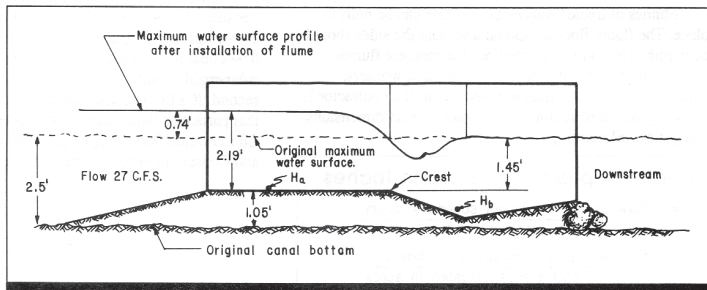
Analysis of upstream and downstream water elevations and crest elevation above the channel bottom.
